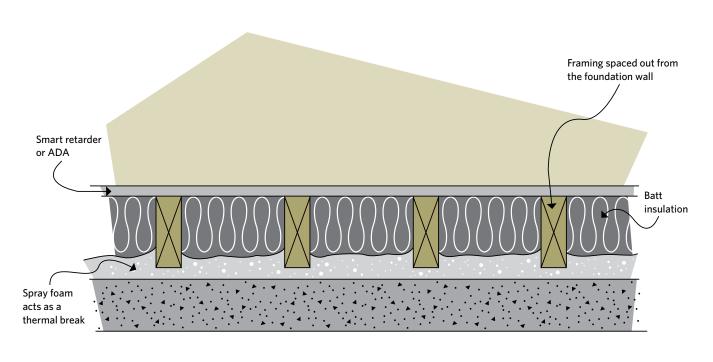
Top view of a framed wall with batt insulation and spray foam
